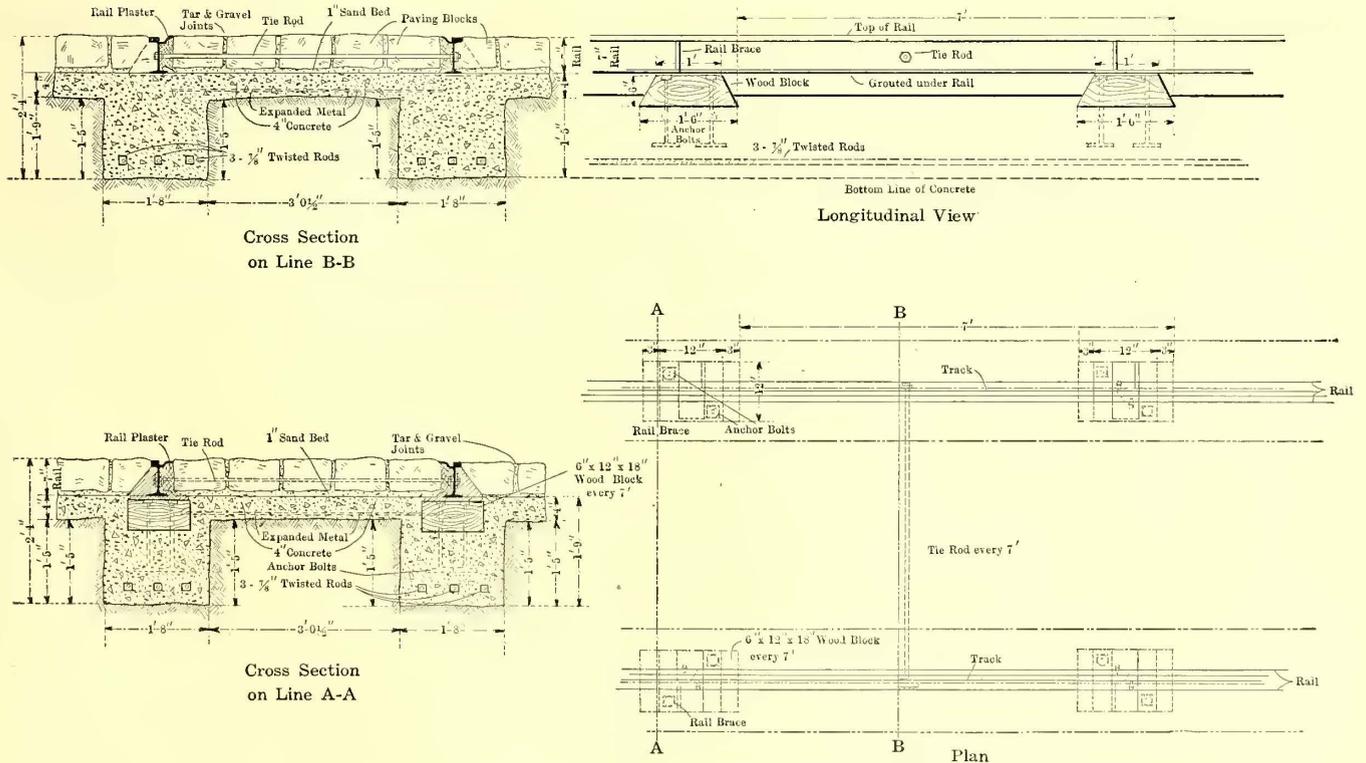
SECTIONS AND PLAN OF TRACK CONSTRUCTION ON CONCRETE WITHOUT TIES
